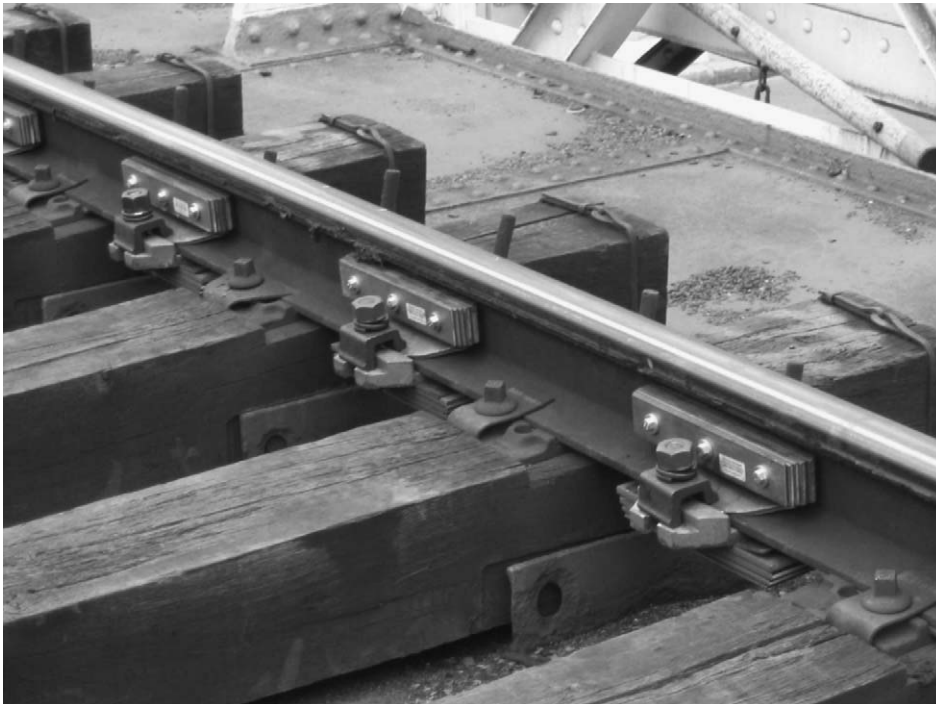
Rail equipped with tuned absorbers on the Gavignot bridge.
